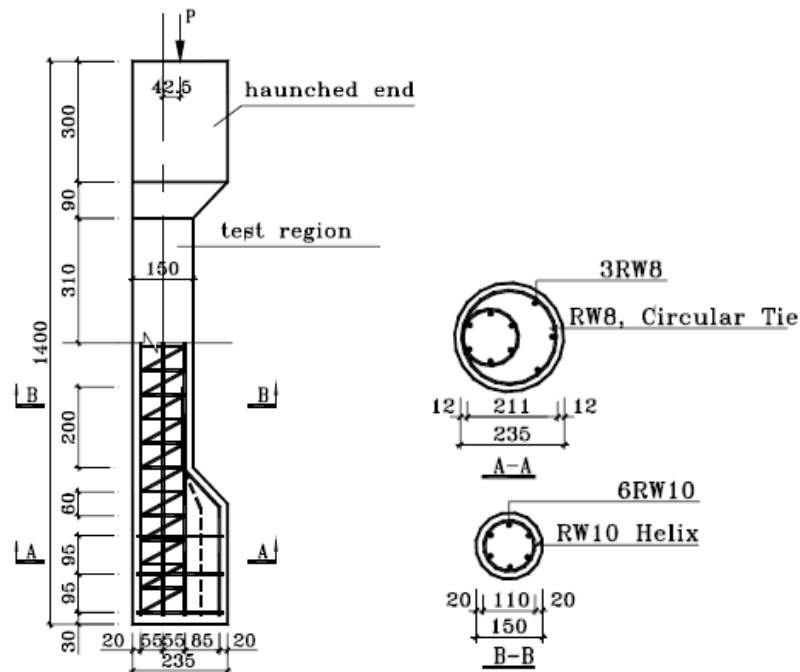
Dimension and internal steel reinforcement details of RC circular column (Li and Hadi, 2003)
